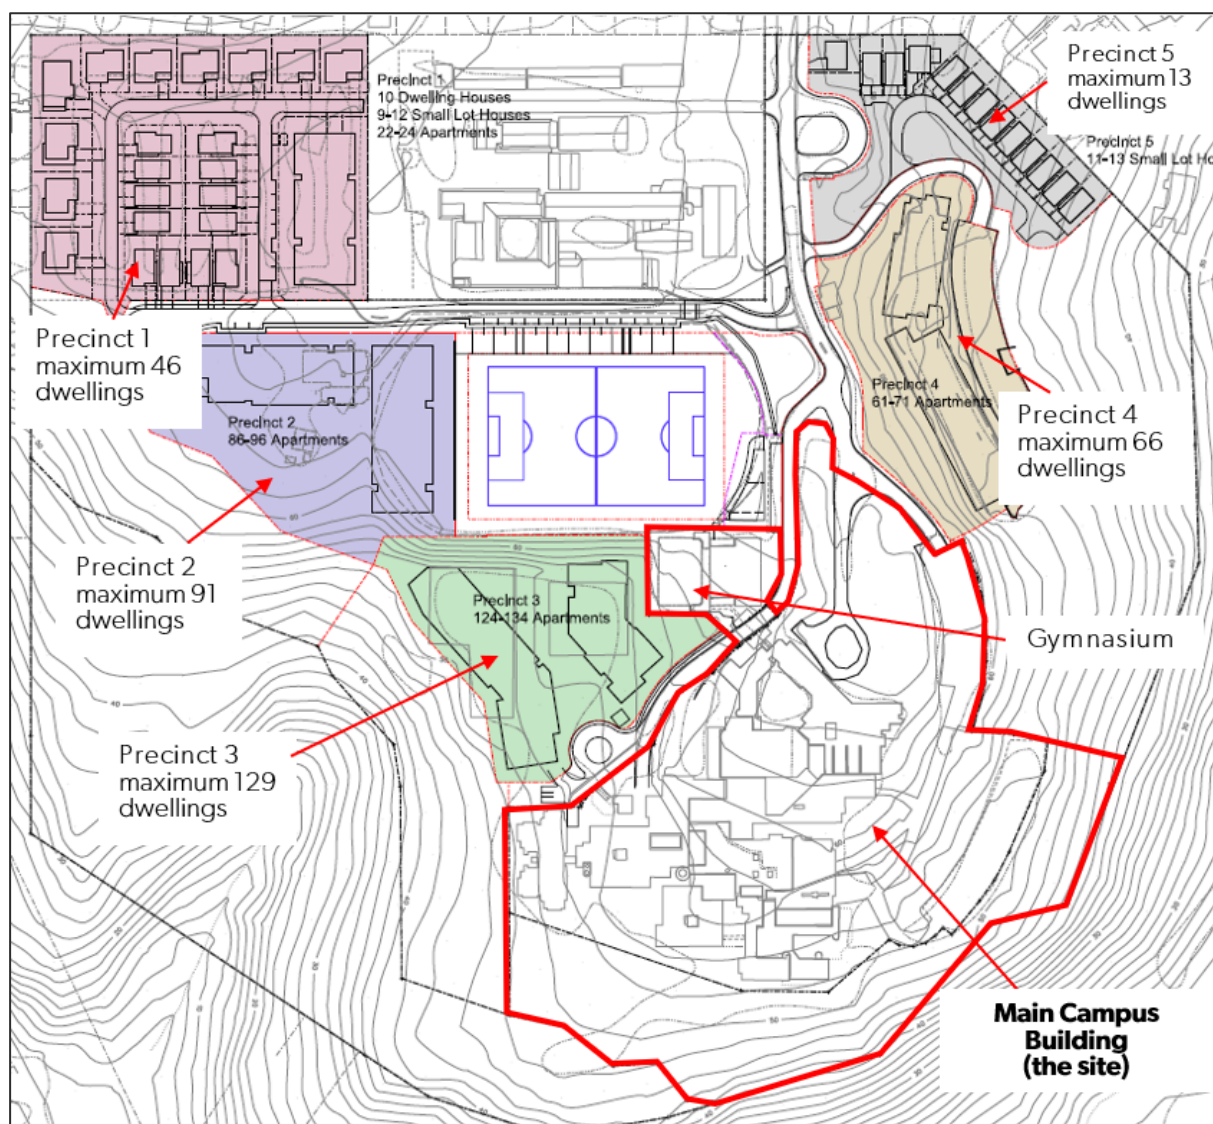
| Concept Plan (as modified) (Source: DEM Architects 2012)
